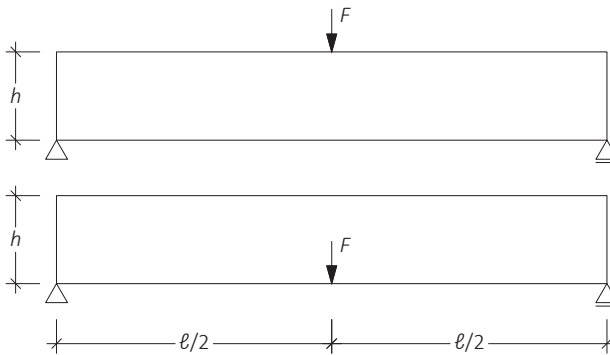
Single-span girder with load applied to the upper or lower edge.
